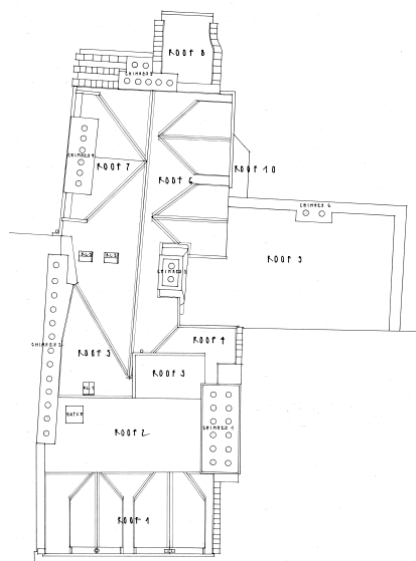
Plan showing roofs, Heath Architect & Stone Consultant, 1988. It shows that the apex of the roof parallel to the street had been replaced with a flat area. NTS archives
